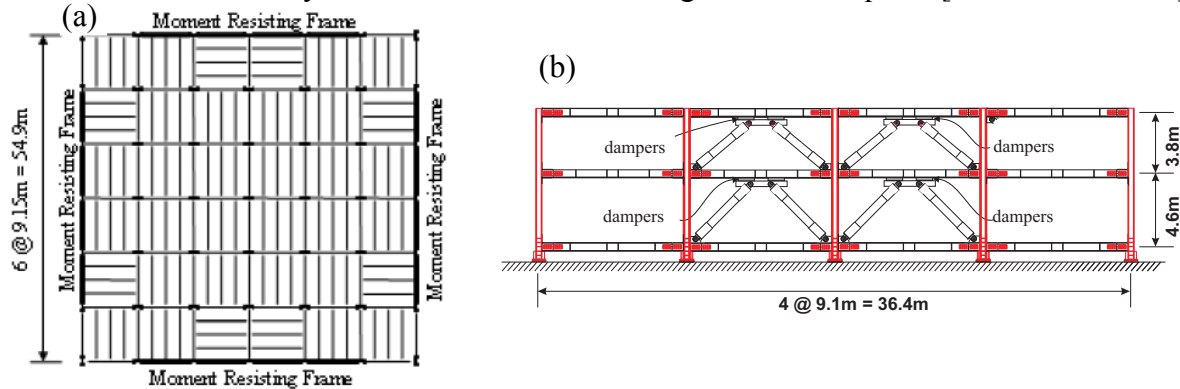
Prototype building (a) plan view; (b) perimeter MRF with dampers and braces
